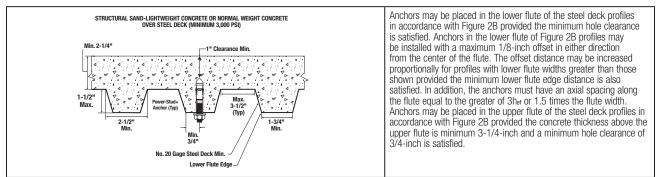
A - Power-Stud+ SD1 Installation Detail for Anchors in the Soffit Of Concrete Over Steel Deck Floor and Roof Assemblies (See Dimensional Profile Requirements)
